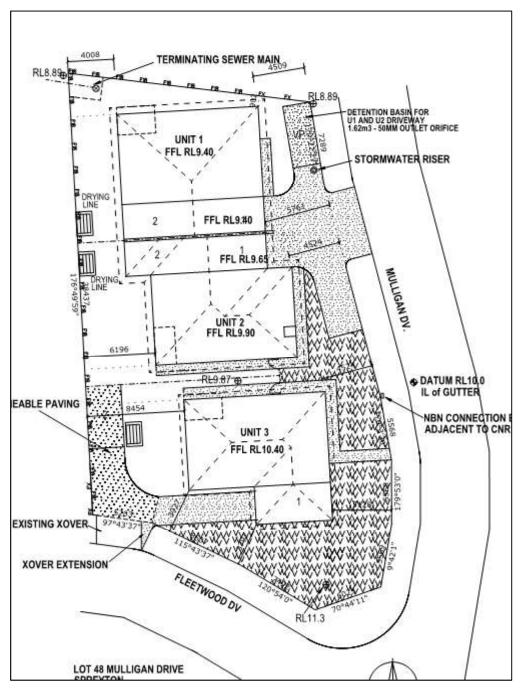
Site Plan of multiple dwelling development (C D Campbell, 2019)
